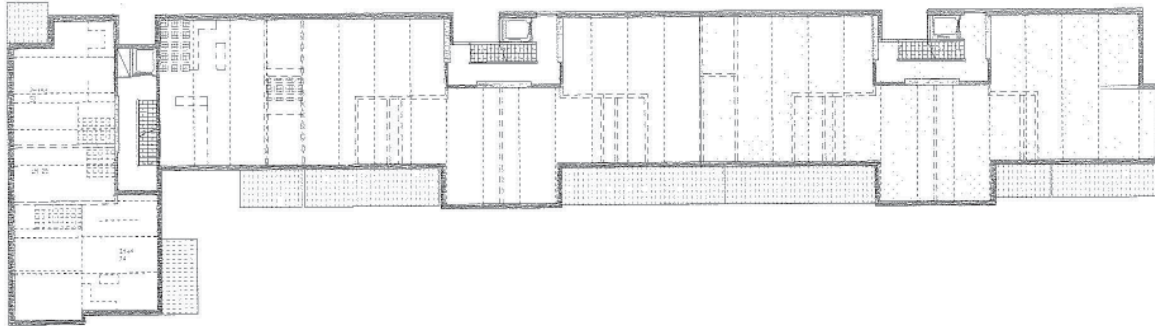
Typical level, support plan without subdivisions (Image courtesy of Esko Khari).
